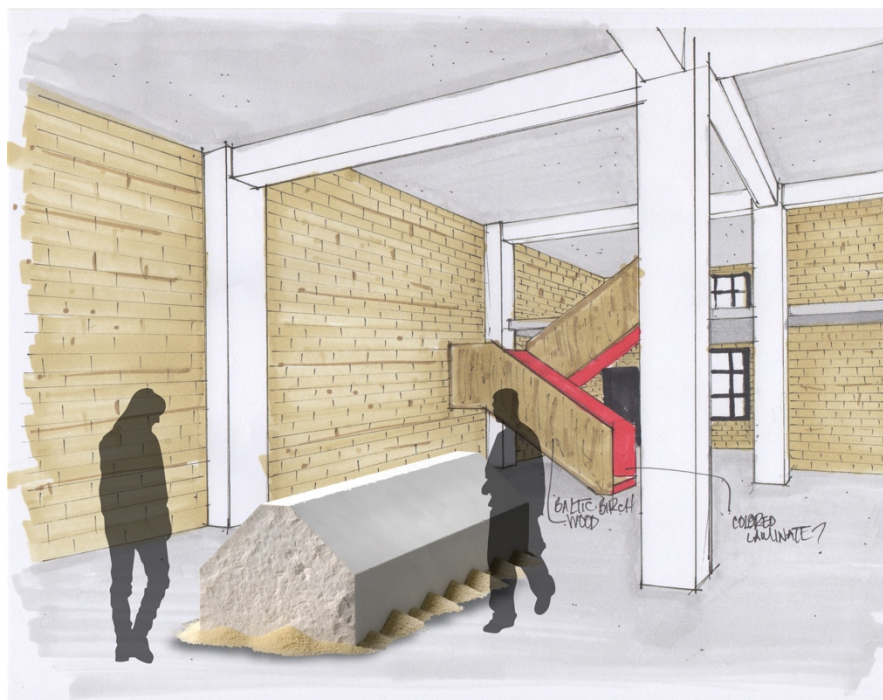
Conceptual sketch of gallery space looking towards the mezzanine. A touch of color highlights the vertical circulation.
